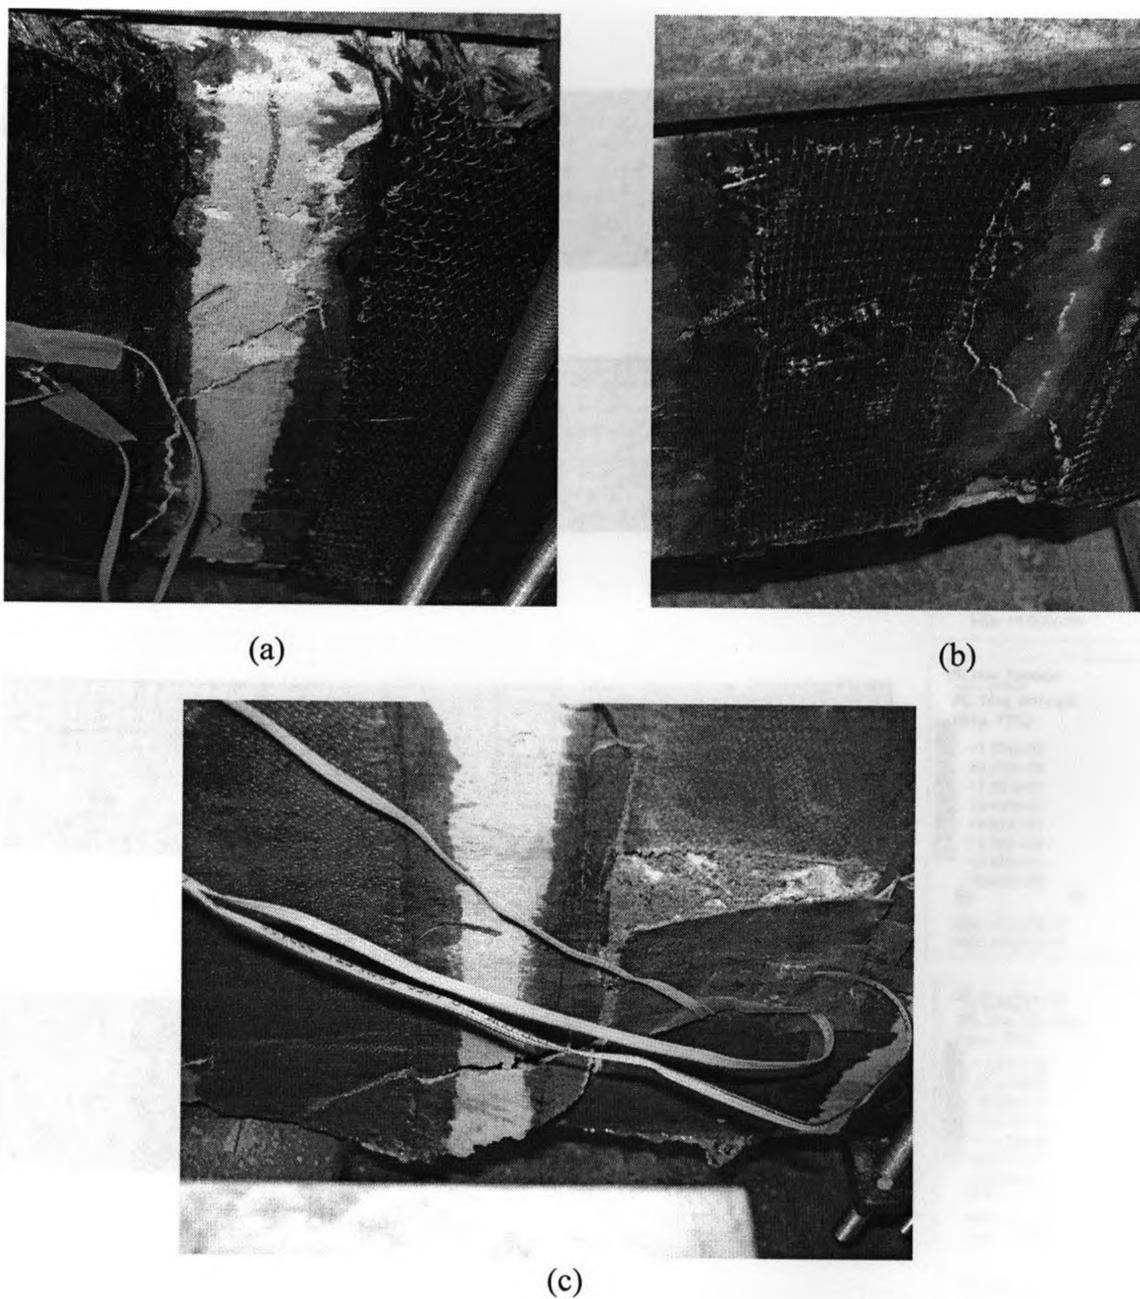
Shear failure and crack pattern for (a) B-I-C specimen, (b) B-II-CG specimen, and (c) B-III-GG specimen.
